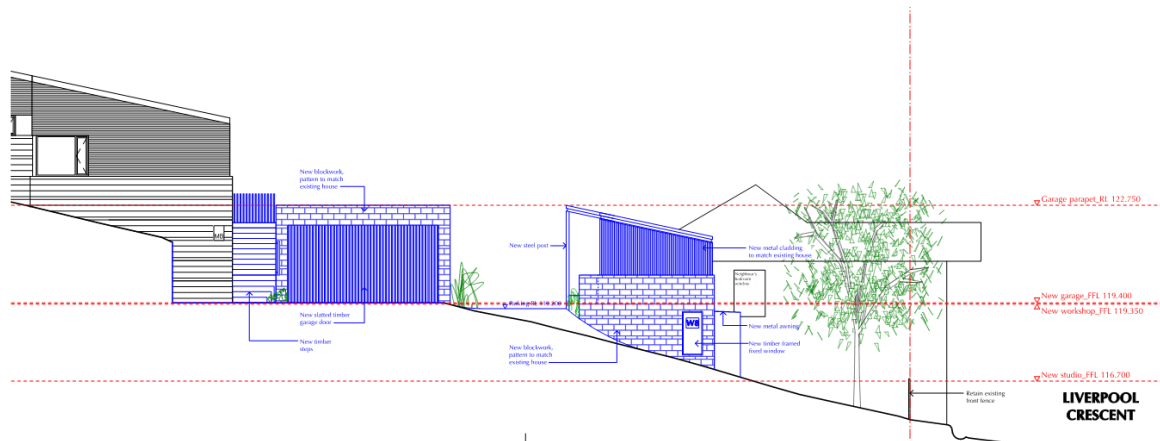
Proposed Elevation as viewed from the driveway looking east and noting the cut in the land.
